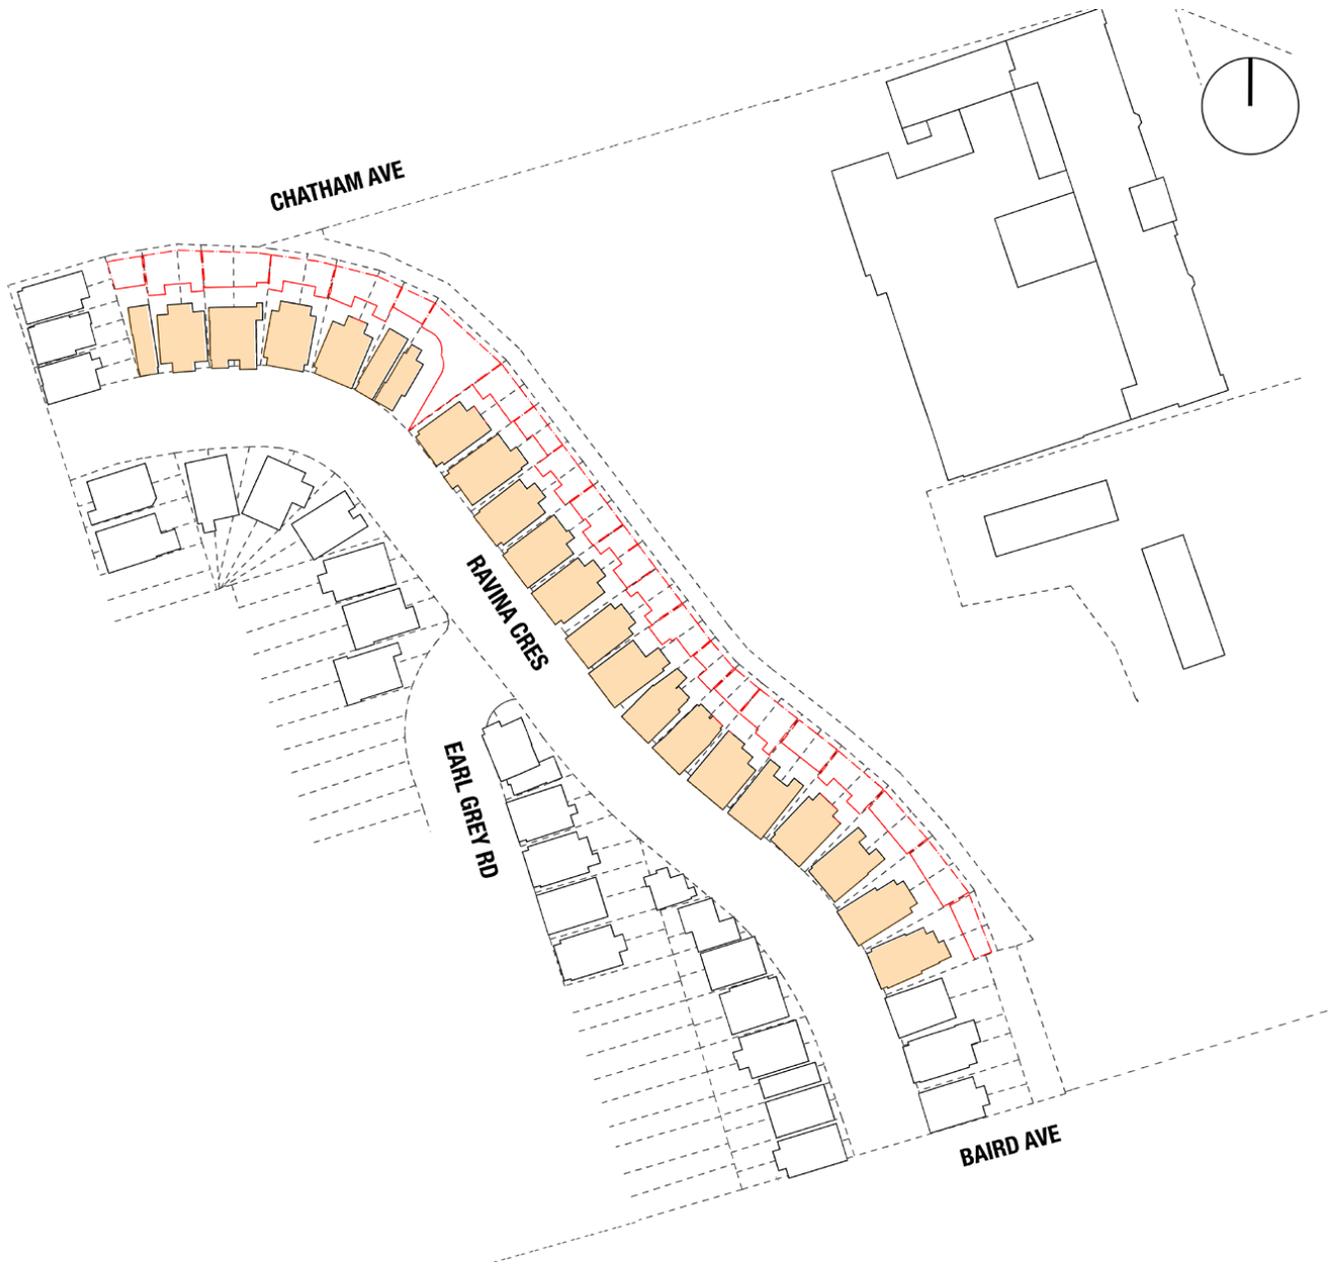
(bottom) - Site Plan - the red dotted lines indicate the maximum building footprint with a 7.5 metres setback from the back of the main house to the back of the laneway suite, but the setbacks are joined for each adjacent semi-detached building
